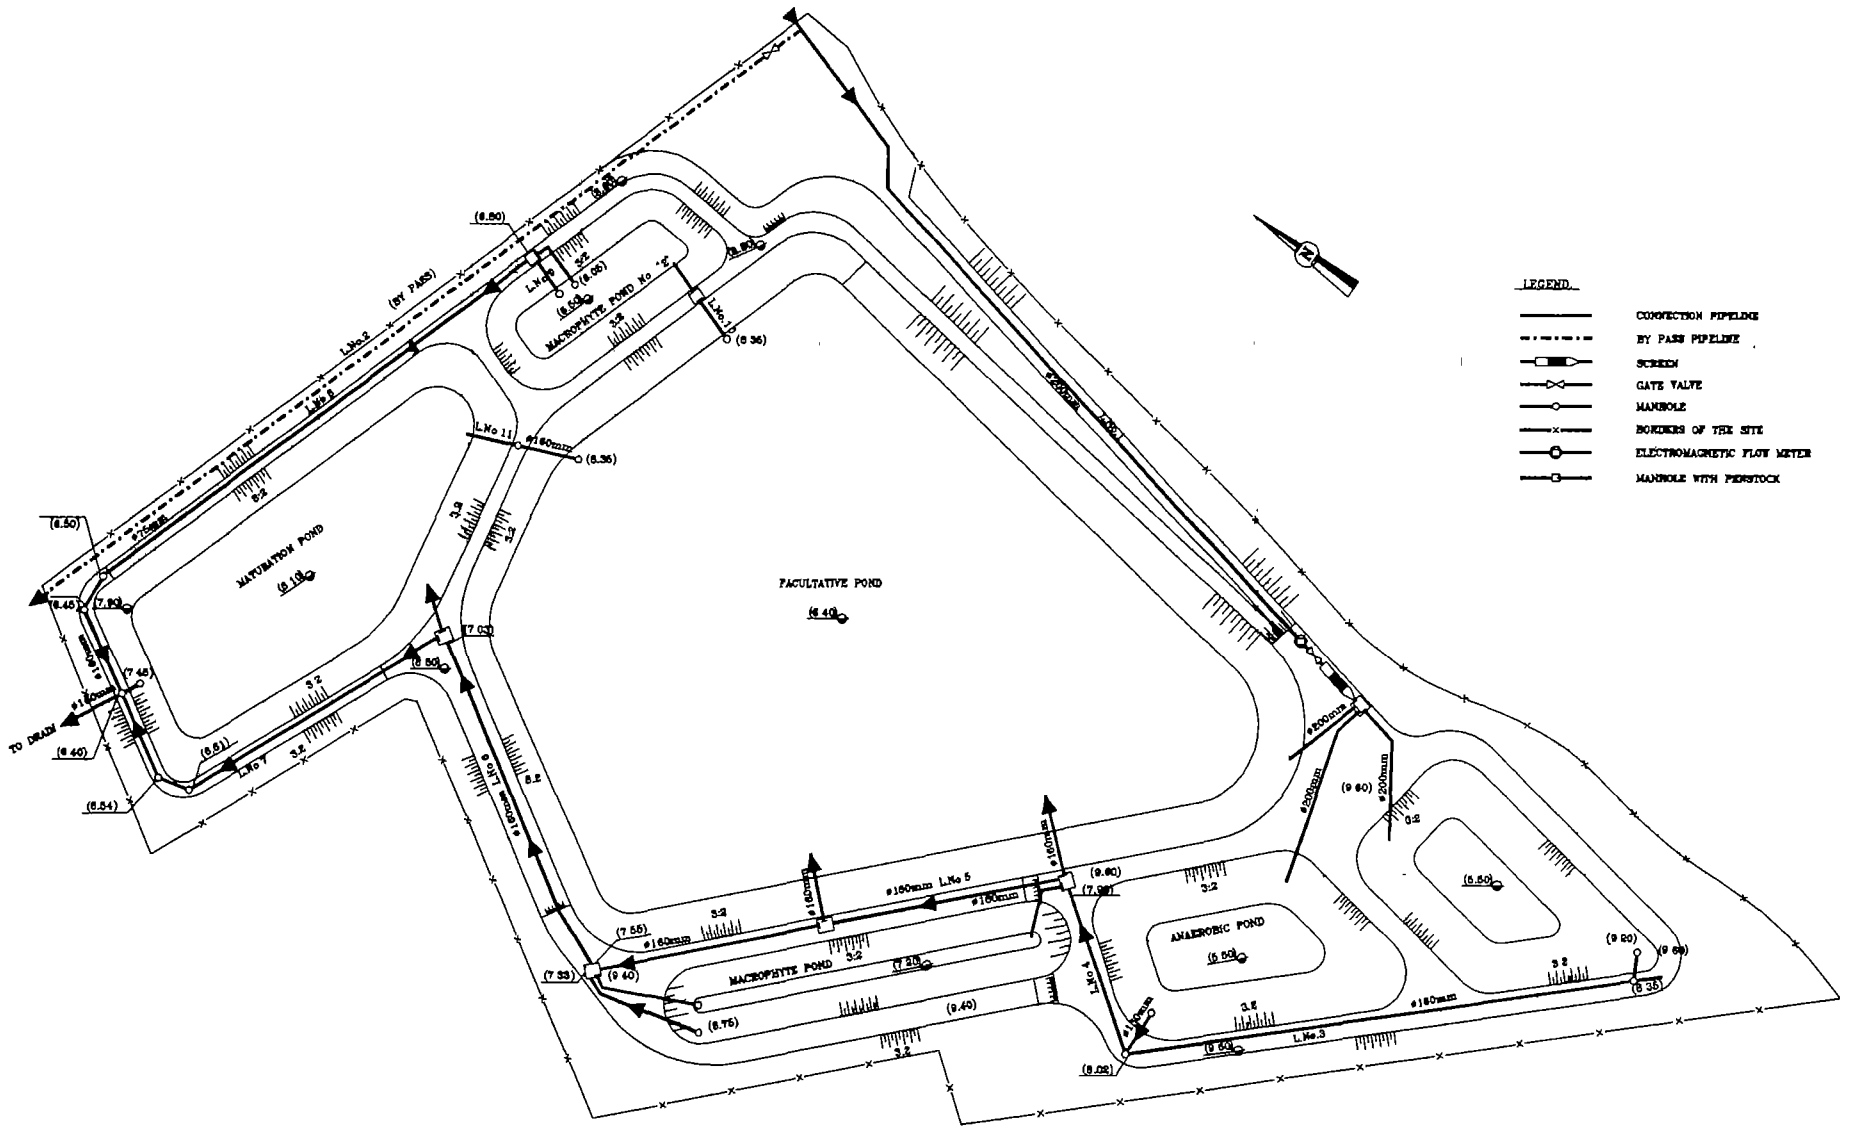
GENERAL LAYOUT FOR SEWAGE TREATMENT PLANT
